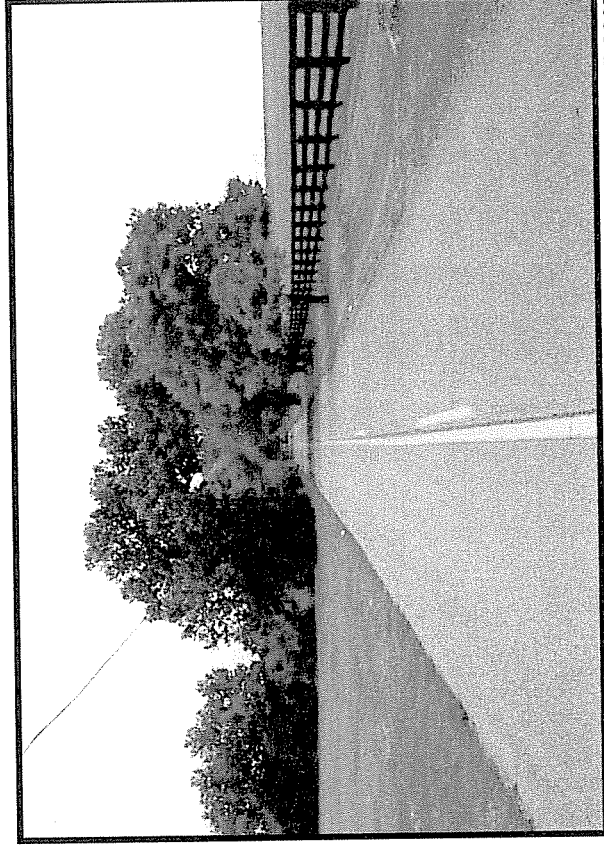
Segment 10 (S.R. 1973), facing east from STA 740+50. (7-17-2007)
